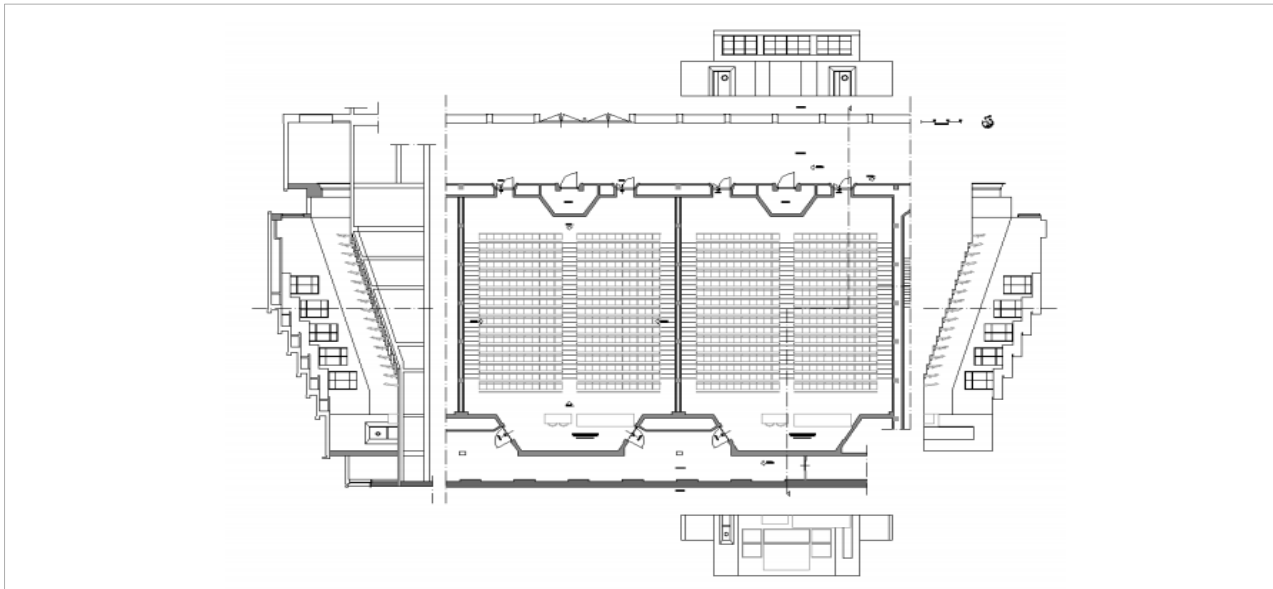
Classrooms used as case study: test room (on the right) and reference room (on the left).
